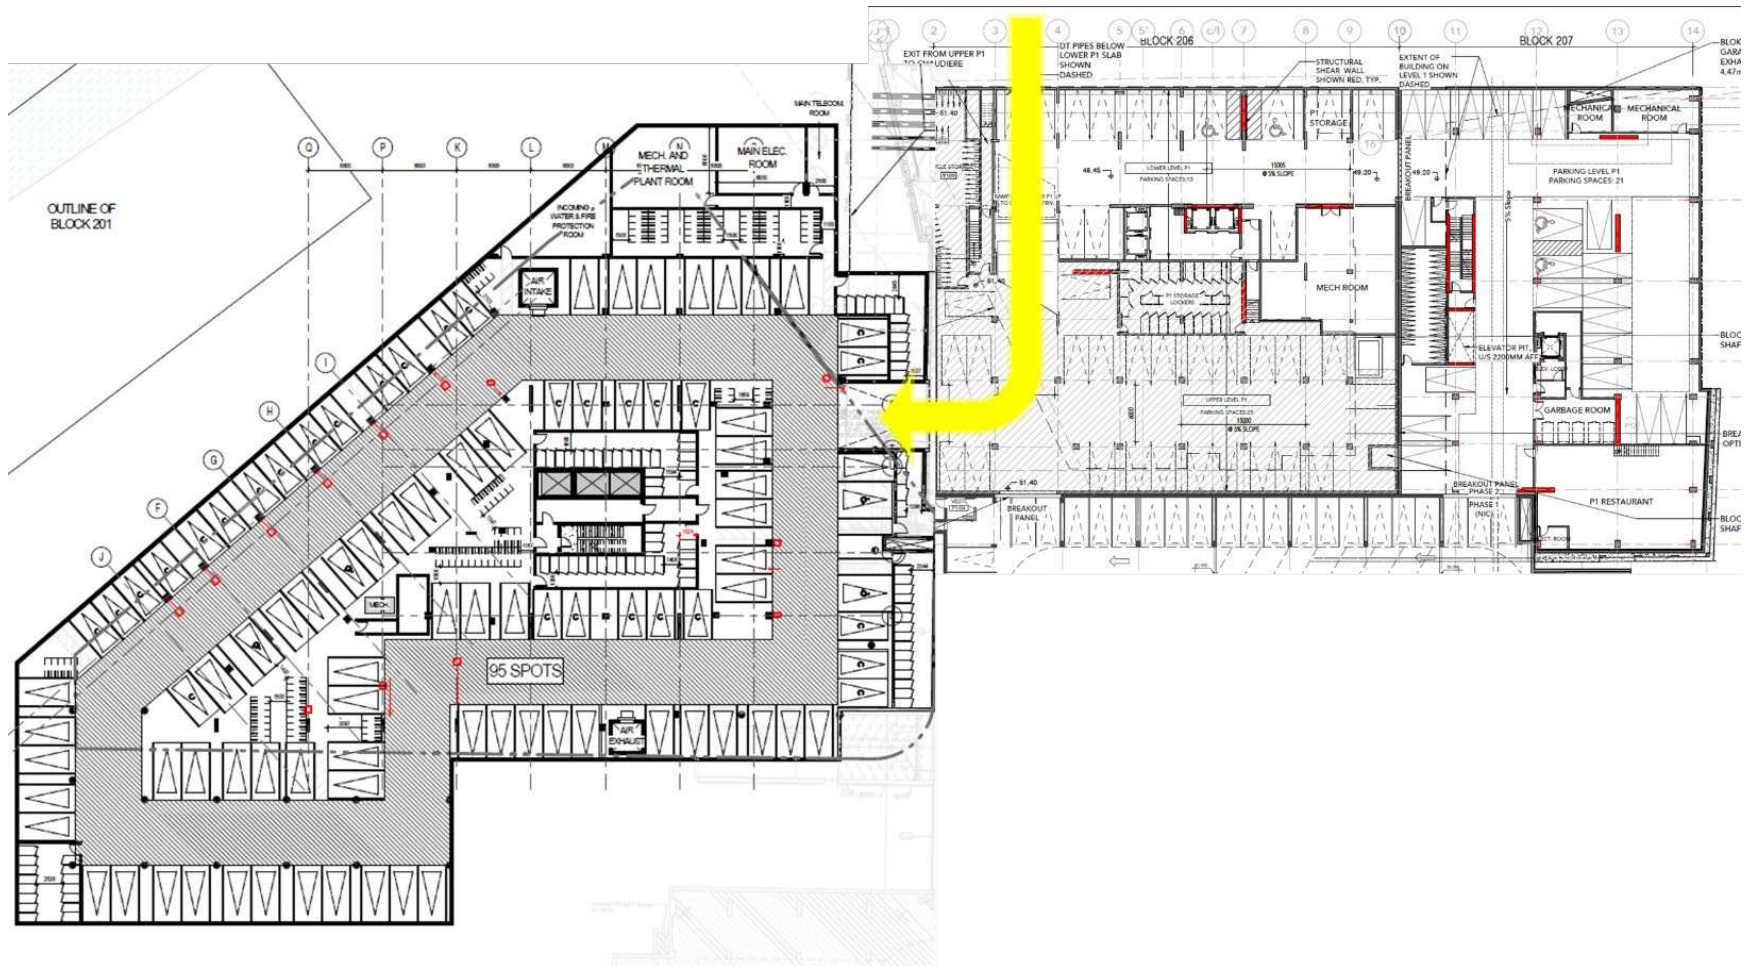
Block 204 On-site Vehicle Circulation (underground parking)
